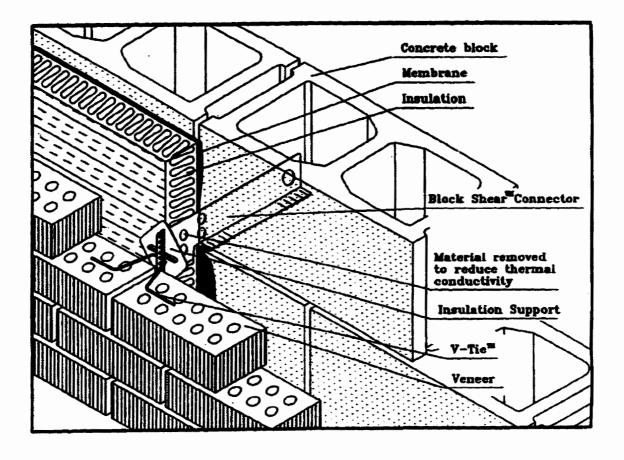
Cavity Wall (courtesy "Tallcrete")
